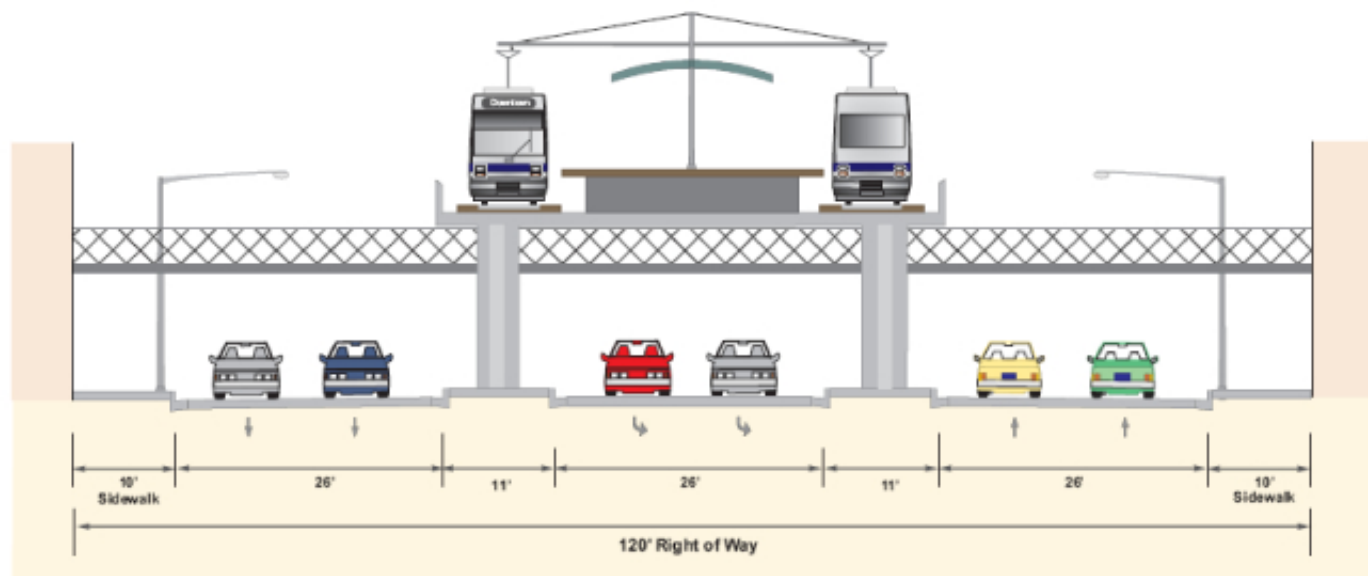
Prototype Section – Aerial Station behind Sidewalk
